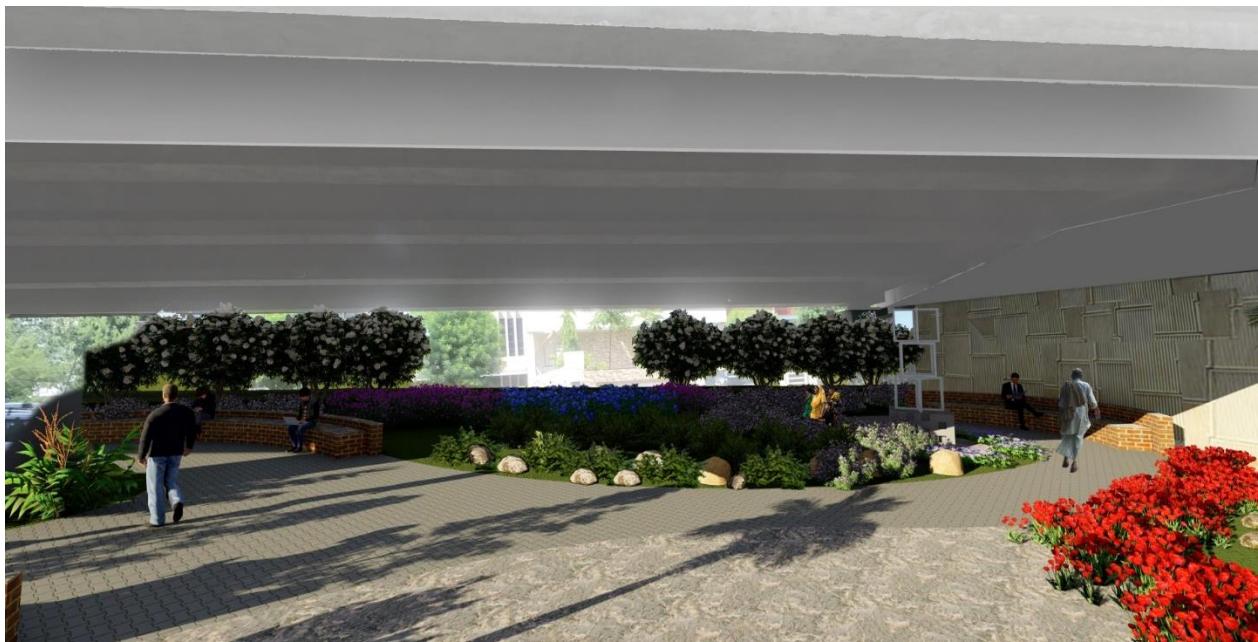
Proposed sculpture with Seat walls at Zone 3 below Kichlu Flyover on Court road.
